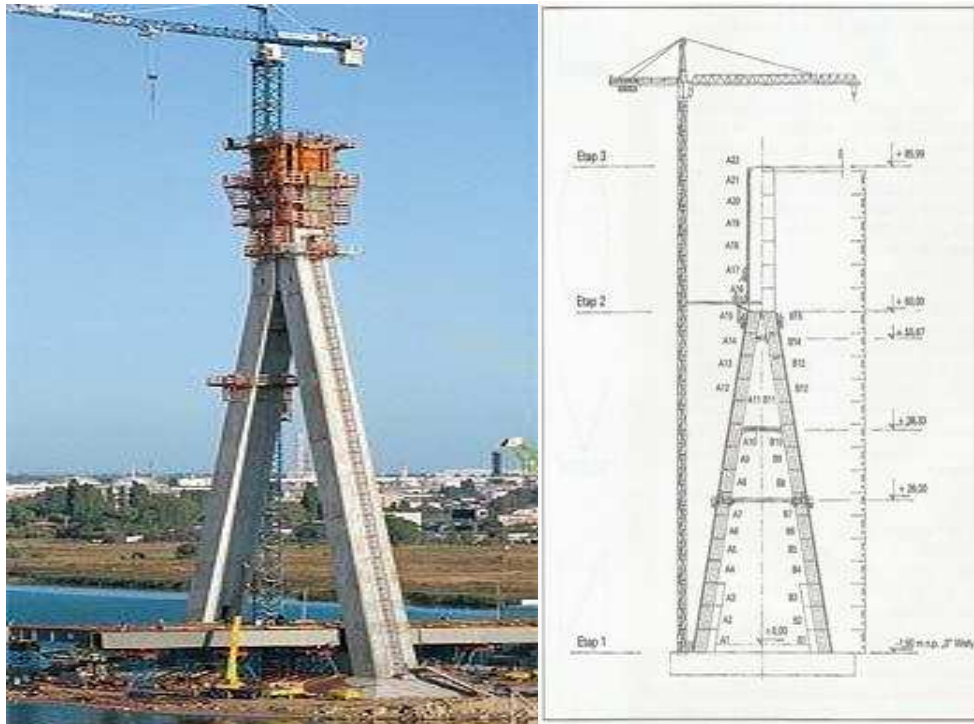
View of bridge support structure (pylon) under construction (Świętokrzyski bridge in Warsaw).
